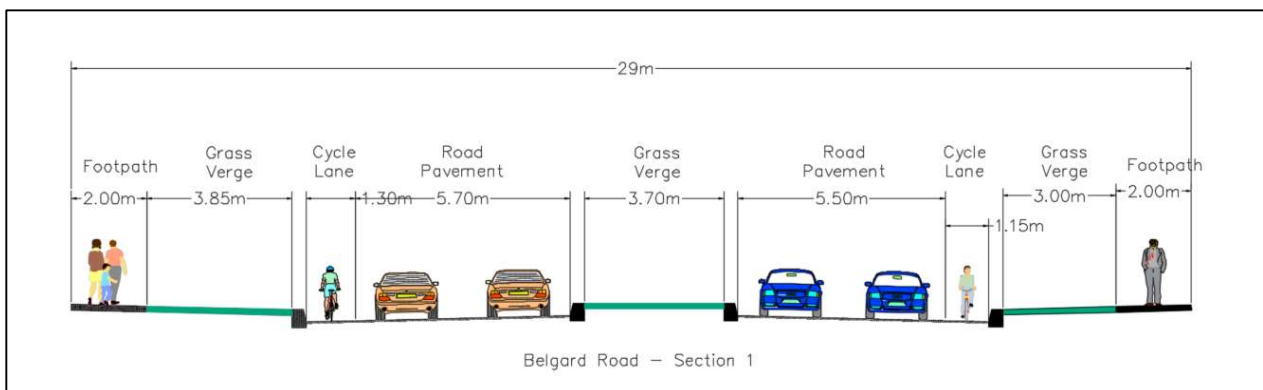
Existing Cross-section 1 (Belgrad Road)
